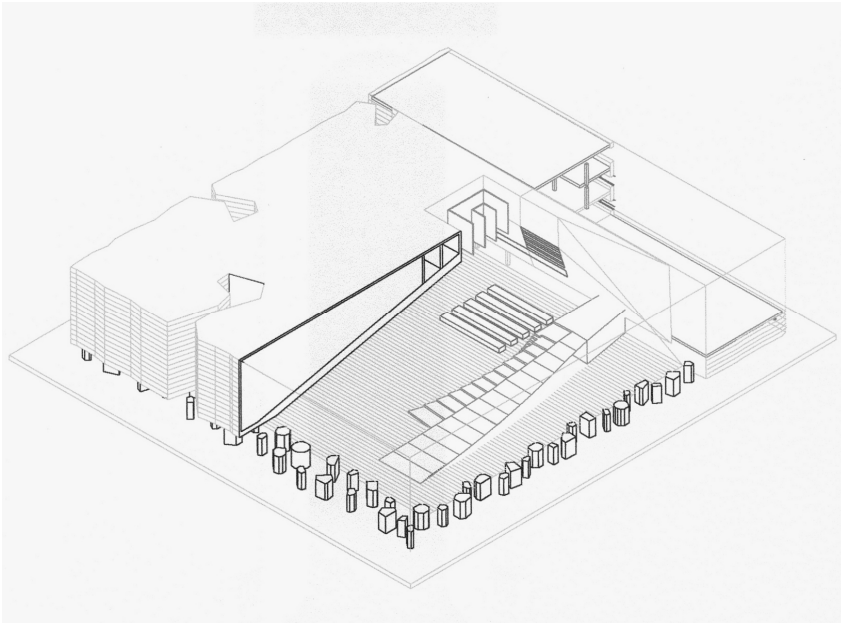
Recyclable cork panels and wood paving at the Hanover Pavilion
